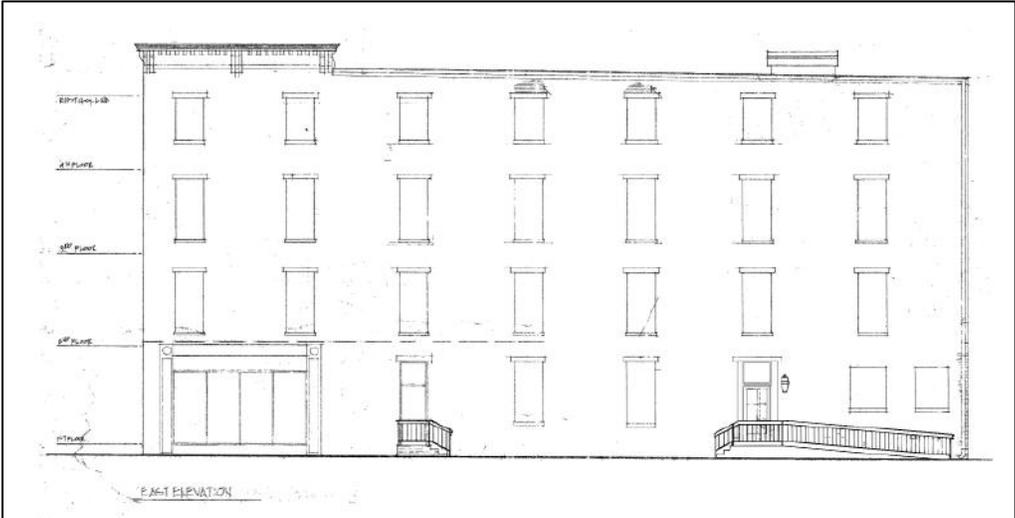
Elevation drawing of North Saint Asaph Street façade.
